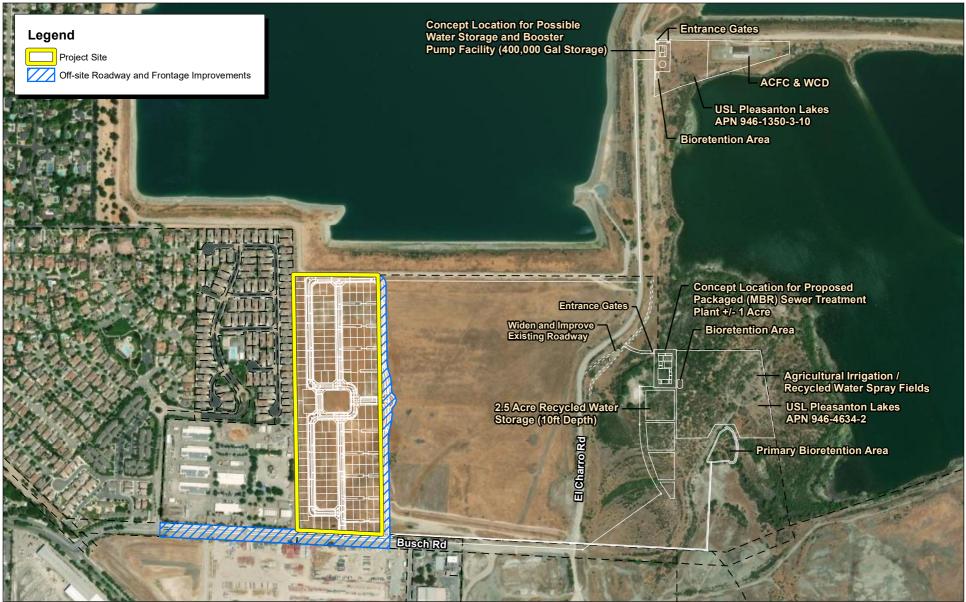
Detailed Residential Site Plan - Northern Portion
